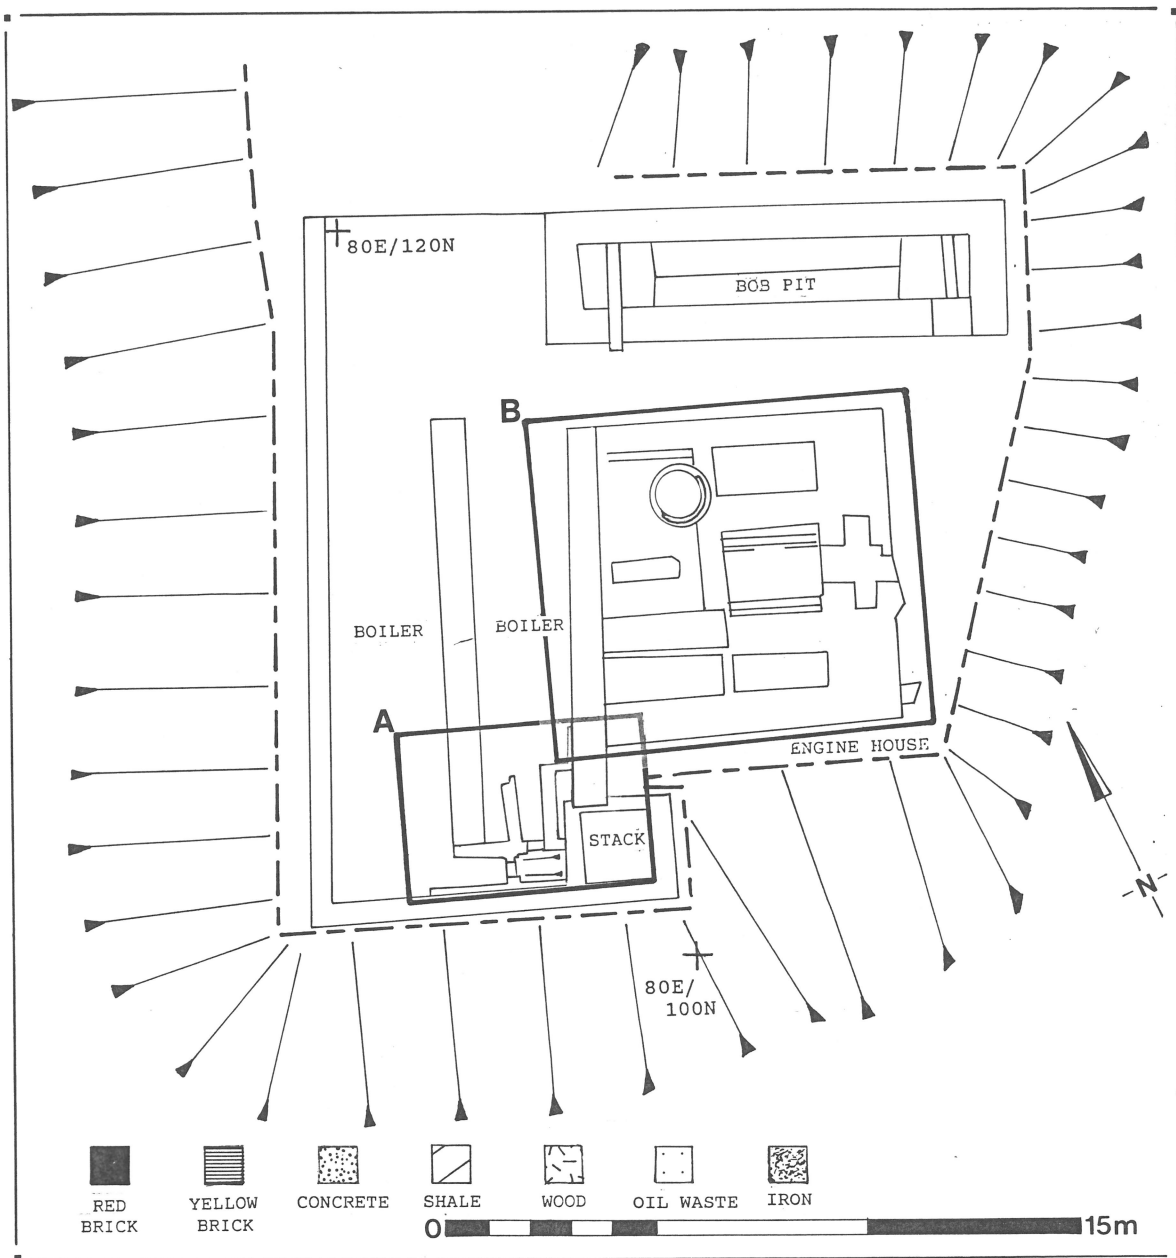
Layout of structures in Area 1 (the key is for all drawings)
